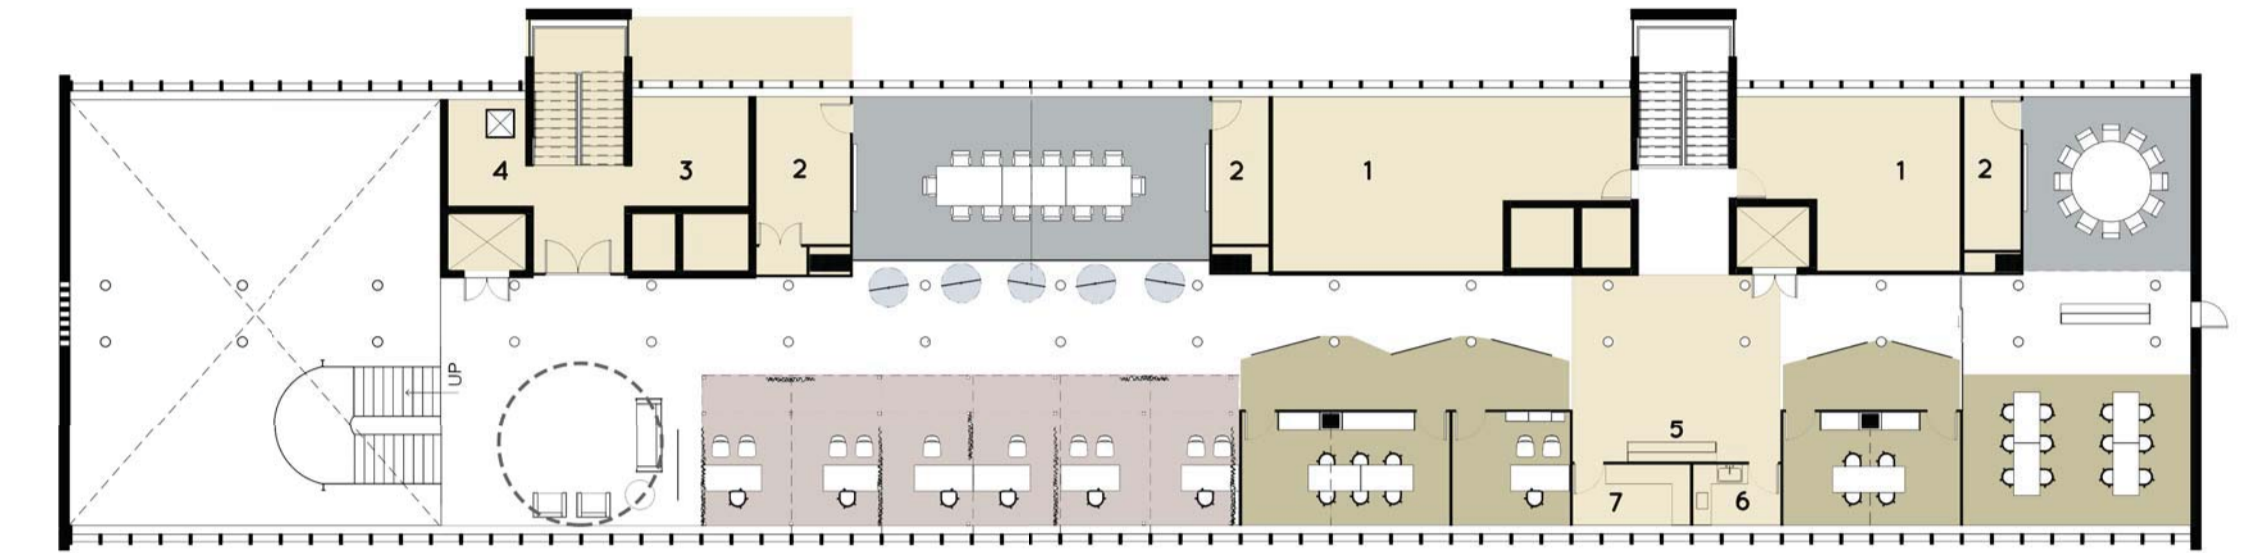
Plan diagram of proposed formal workspace typologies.
